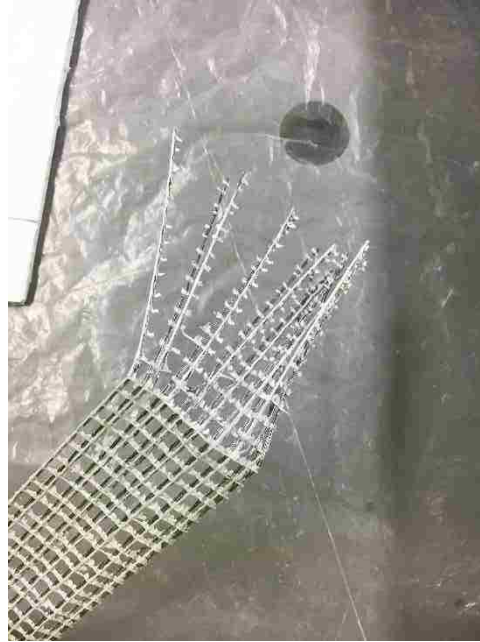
Fiberglass backing removed from anchor portion of steel fibers (75 mm anchor shown, 150 mm anchor similar)
